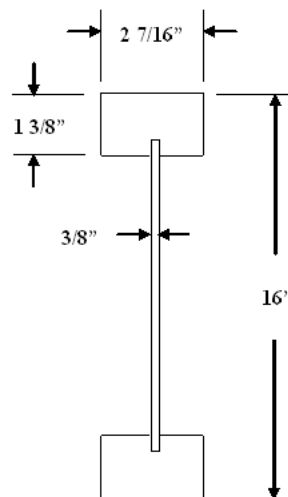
16 in. Deep GPI[®] 65 Cross-Sectional Dimensions
